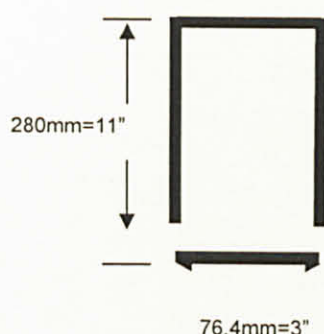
Cross Section Dimension of Beam Reinforcement
